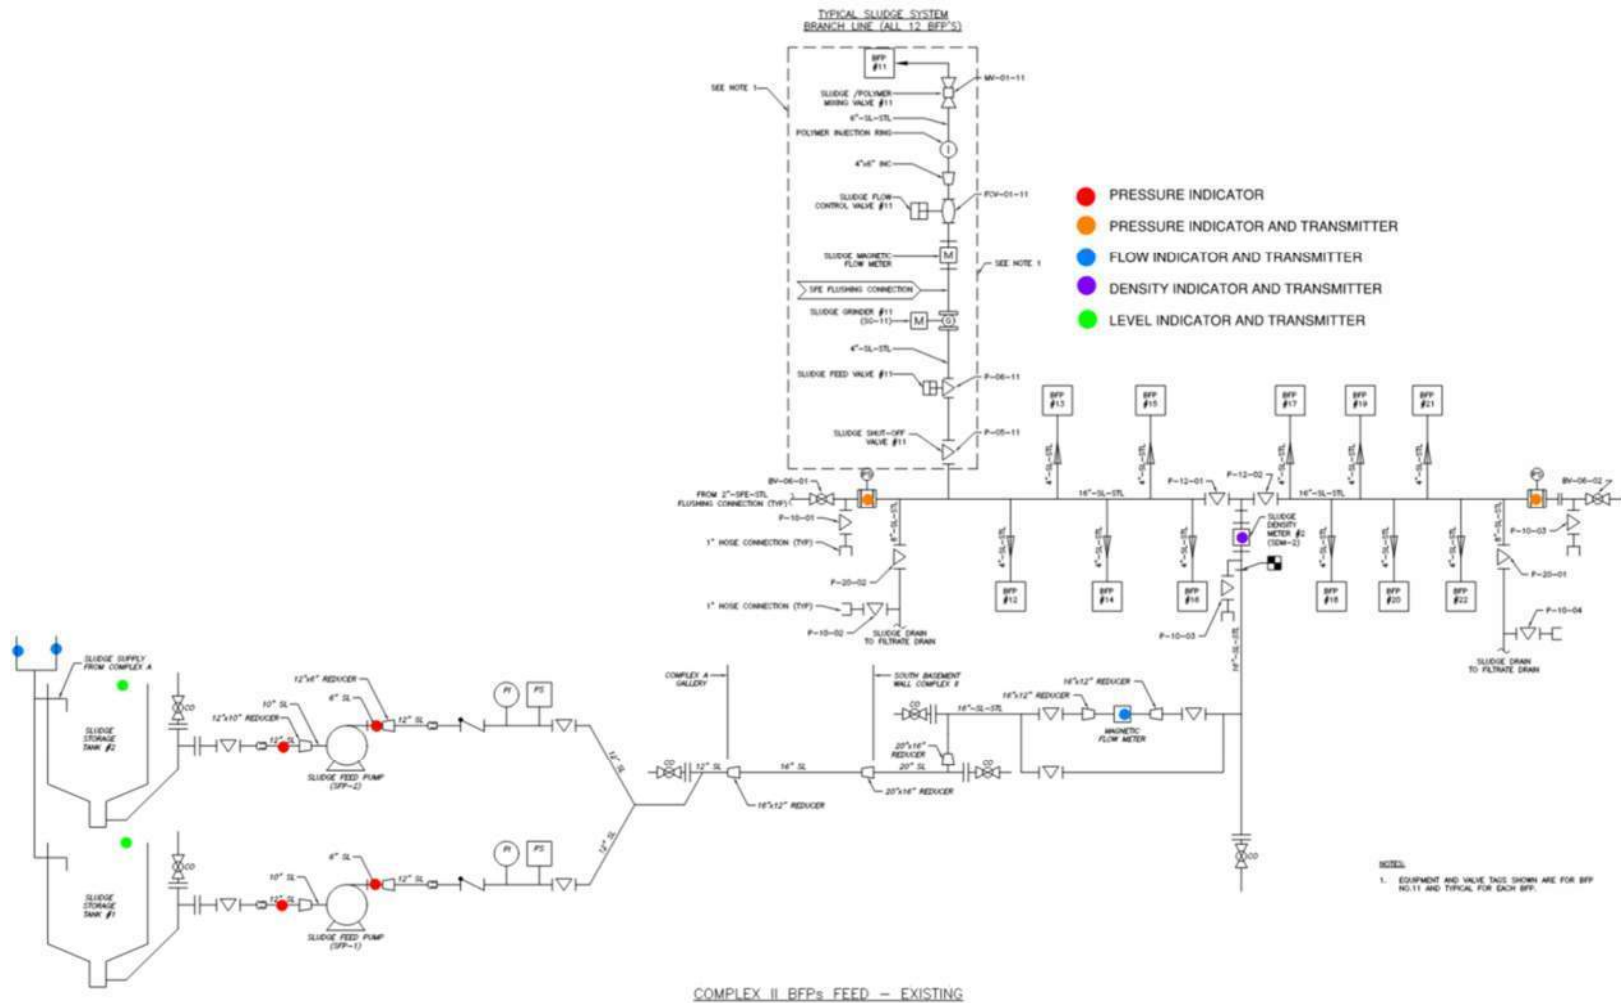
C-II Sludge Feed System Schematic - Instrument Locations
